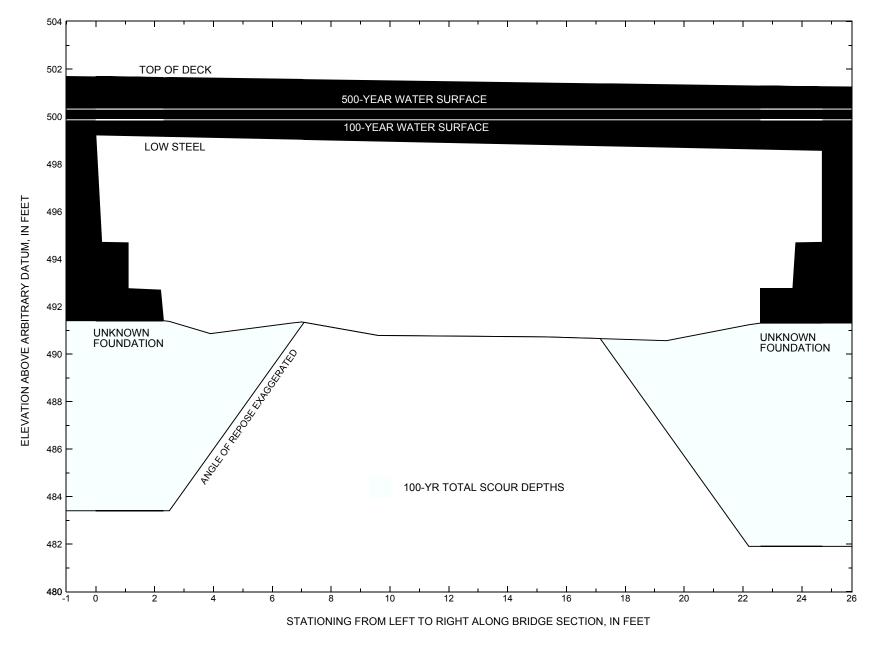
Scour elevations for the 100-year discharge at structure CHARTH00010007 on town highway 1, crossing Mad Brook, Charleston, Vermont.
